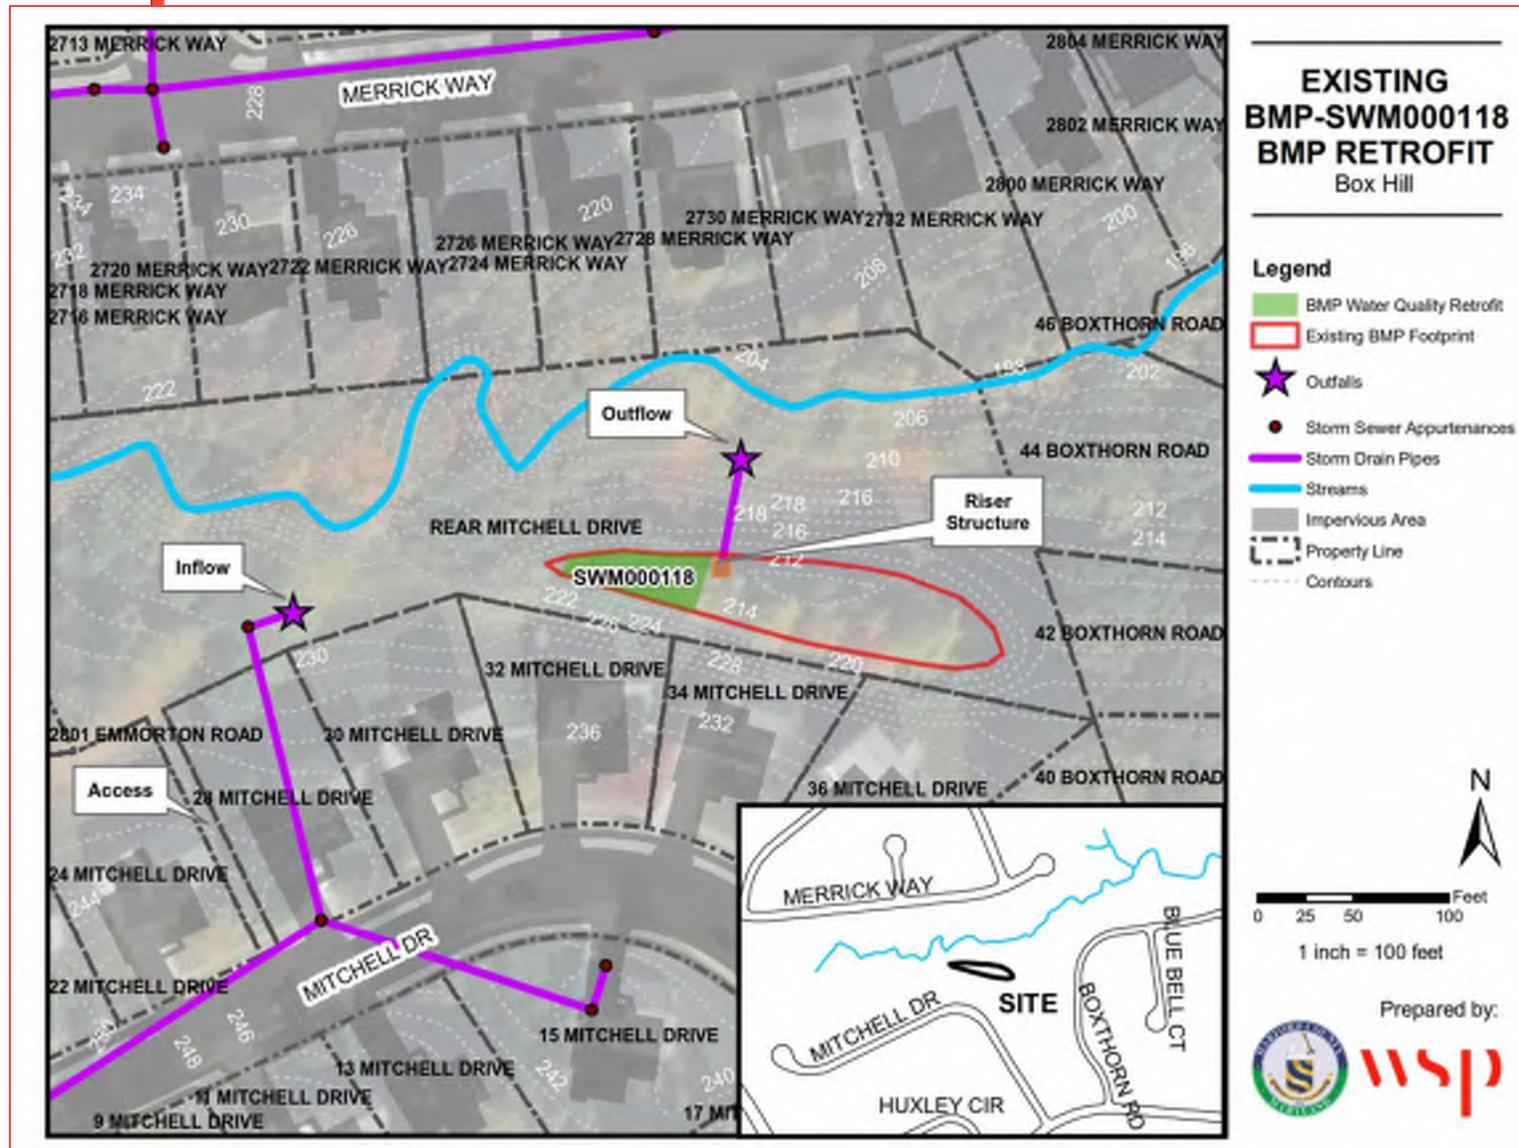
Site Location and Proposed Retrofit for Existing BMP-SWM000118
